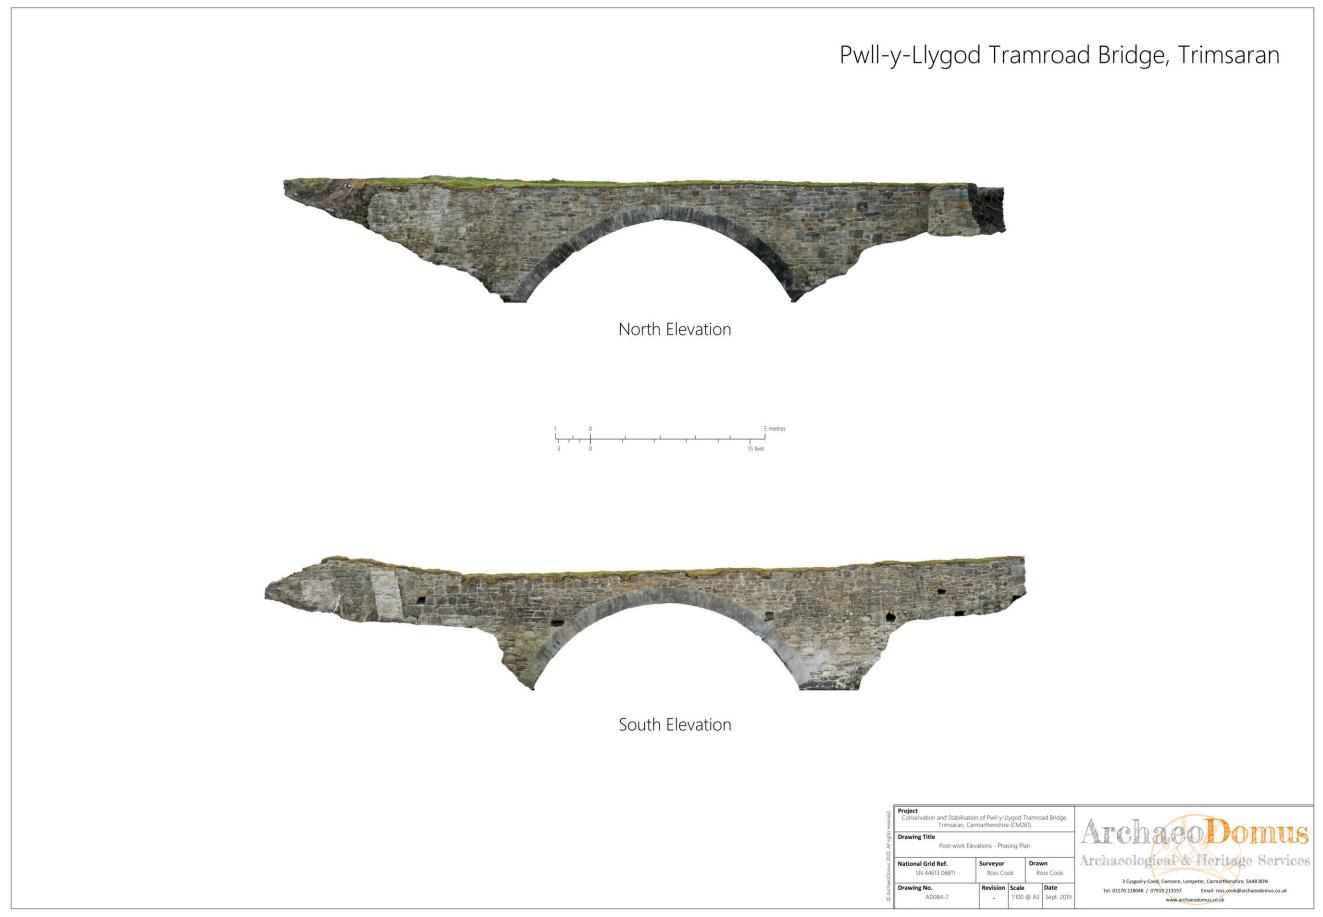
Post-work photogrammetric orthoplanes, Pwll-y-Llygod Tramroad Bridge.
